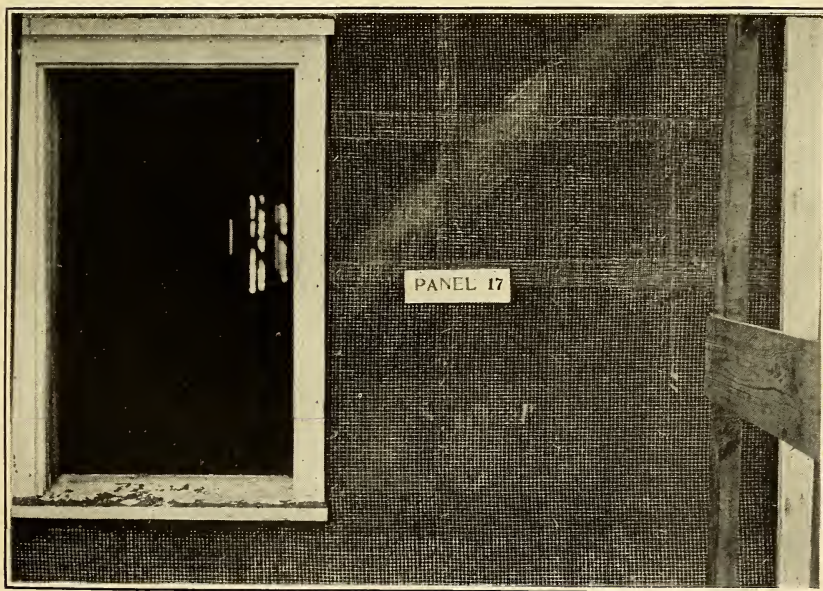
Galvanized woven wire lath on panel No. 17
